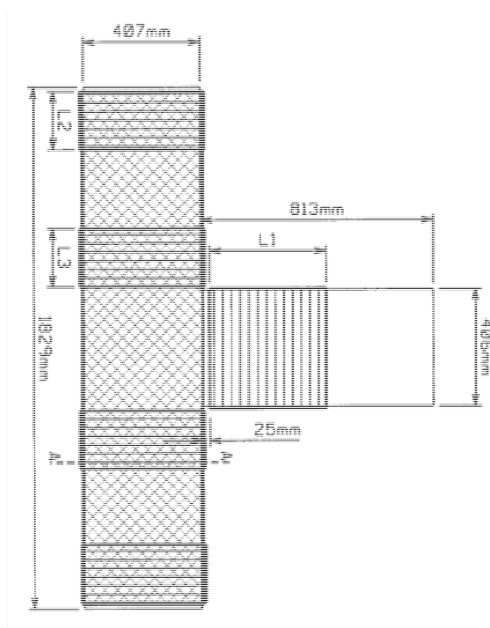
FRP strengthening layout for exterior T-joint of a typical bridge bent (Gergely et al., 2000).
